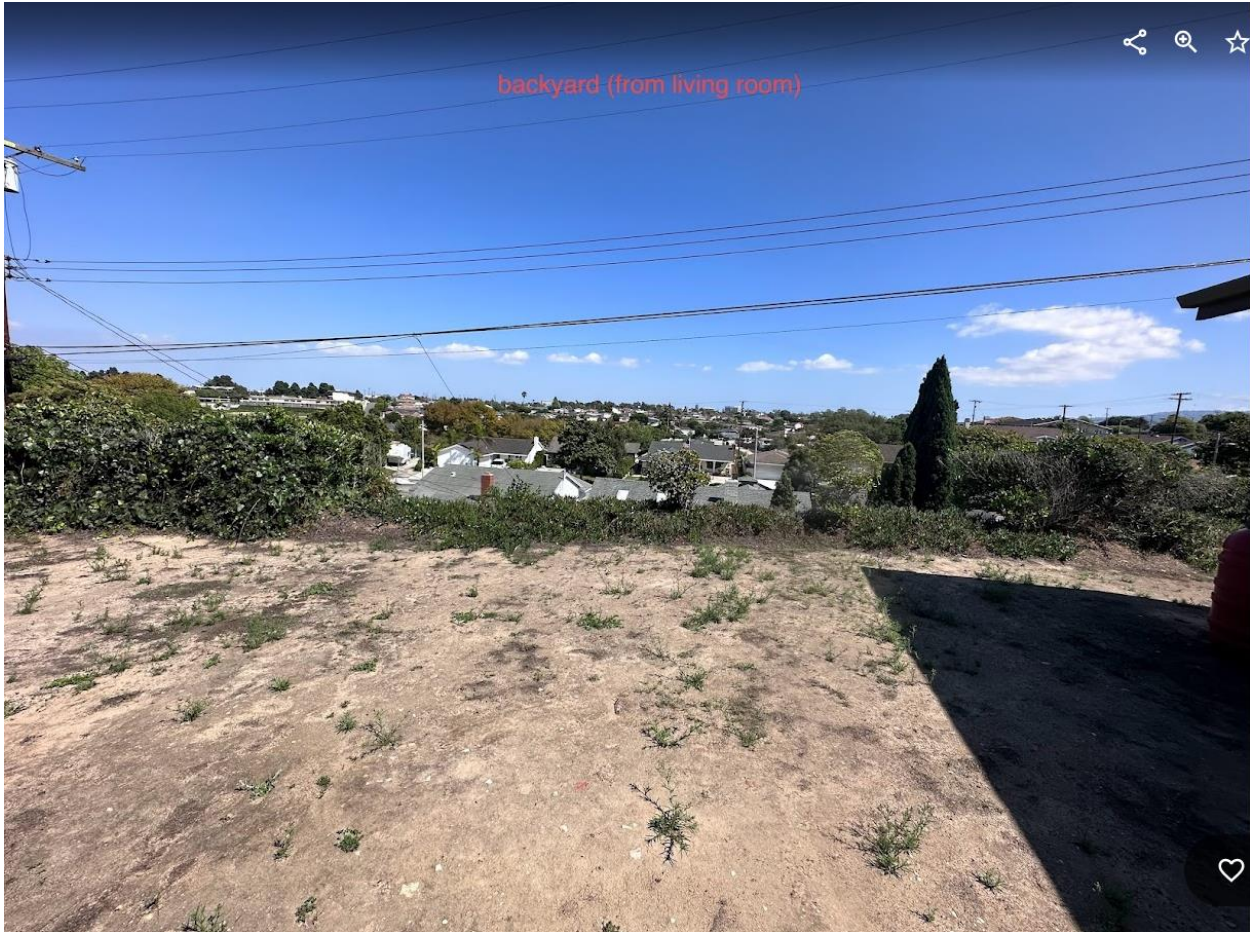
A: 5608 White Ct before deck construction. Note: area greater than 10' and not part of 10' setback.
